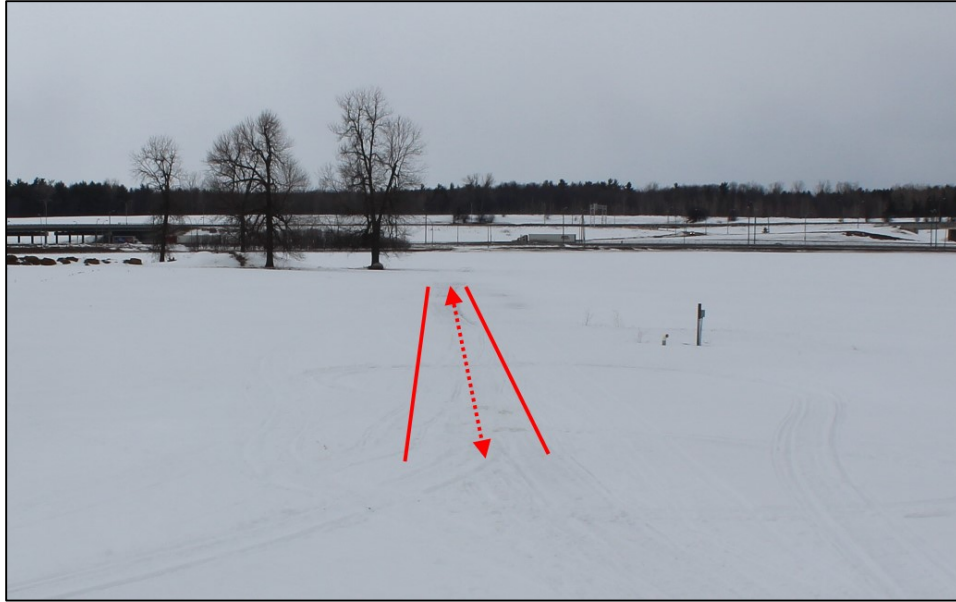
Ground view of laneway (highlighted) at Location 1.
